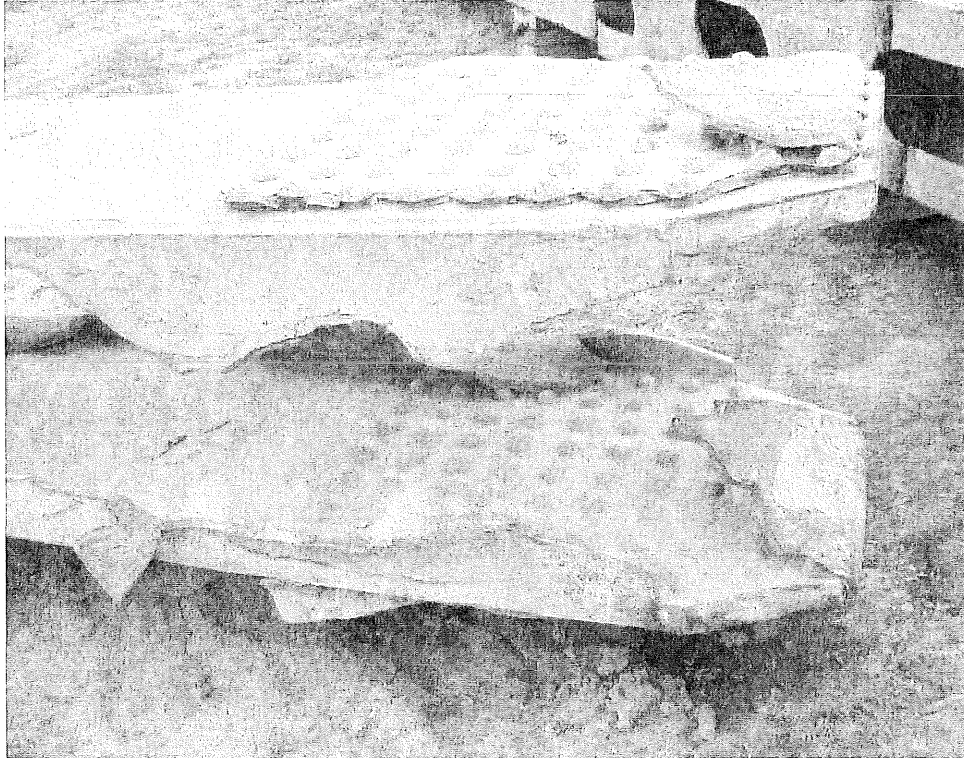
L9-U10W, U10W end, east elevation facing up.
